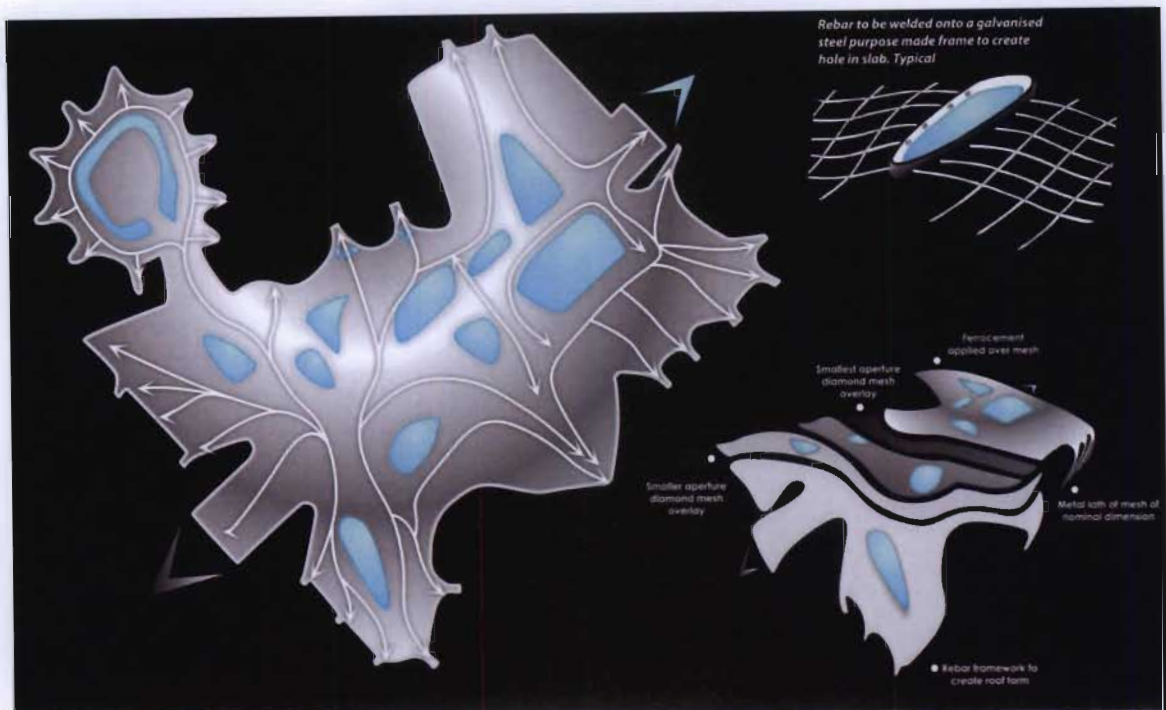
Shows the ferro-cement method of construction, (Author, 2011)
